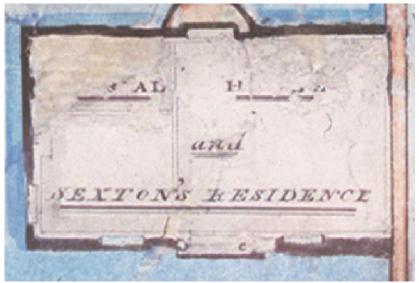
Jewish section Burial House plan. Source: Great Synagogue, Sydney.
